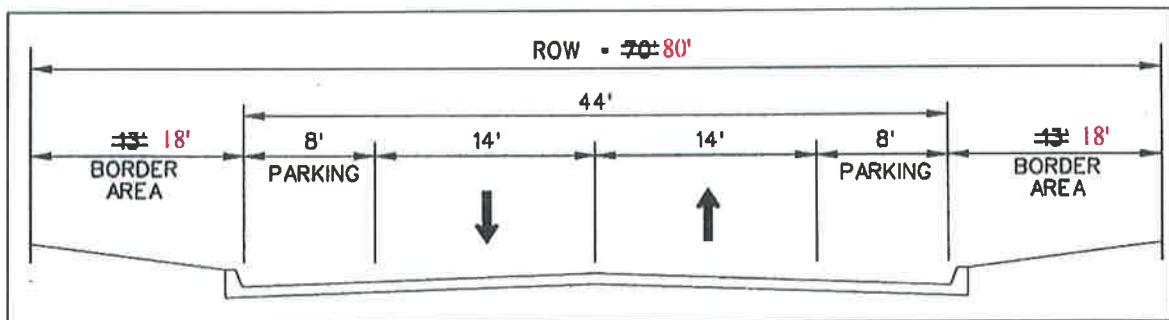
Typical Roadway Sections for Collectors – Alternative 2.
